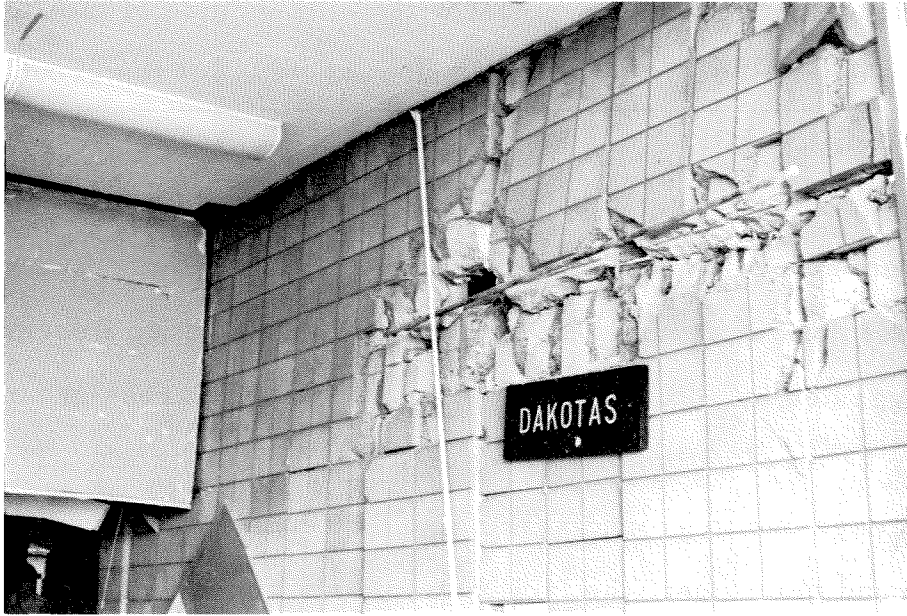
Damage to reinforced concrete block wall at the San Fernando Juvenile Facility. See also Figure 3.99.
